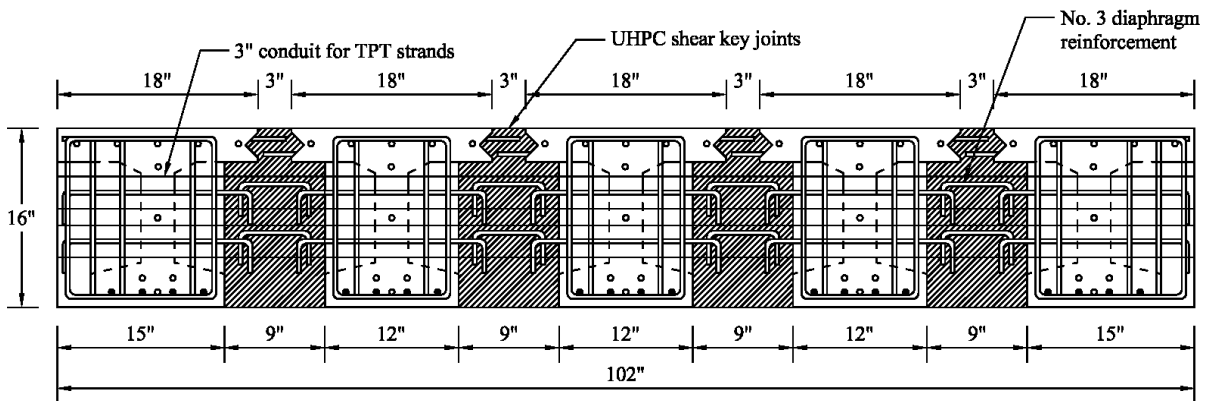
Cross section of bridge model at intermediate diaphragms
